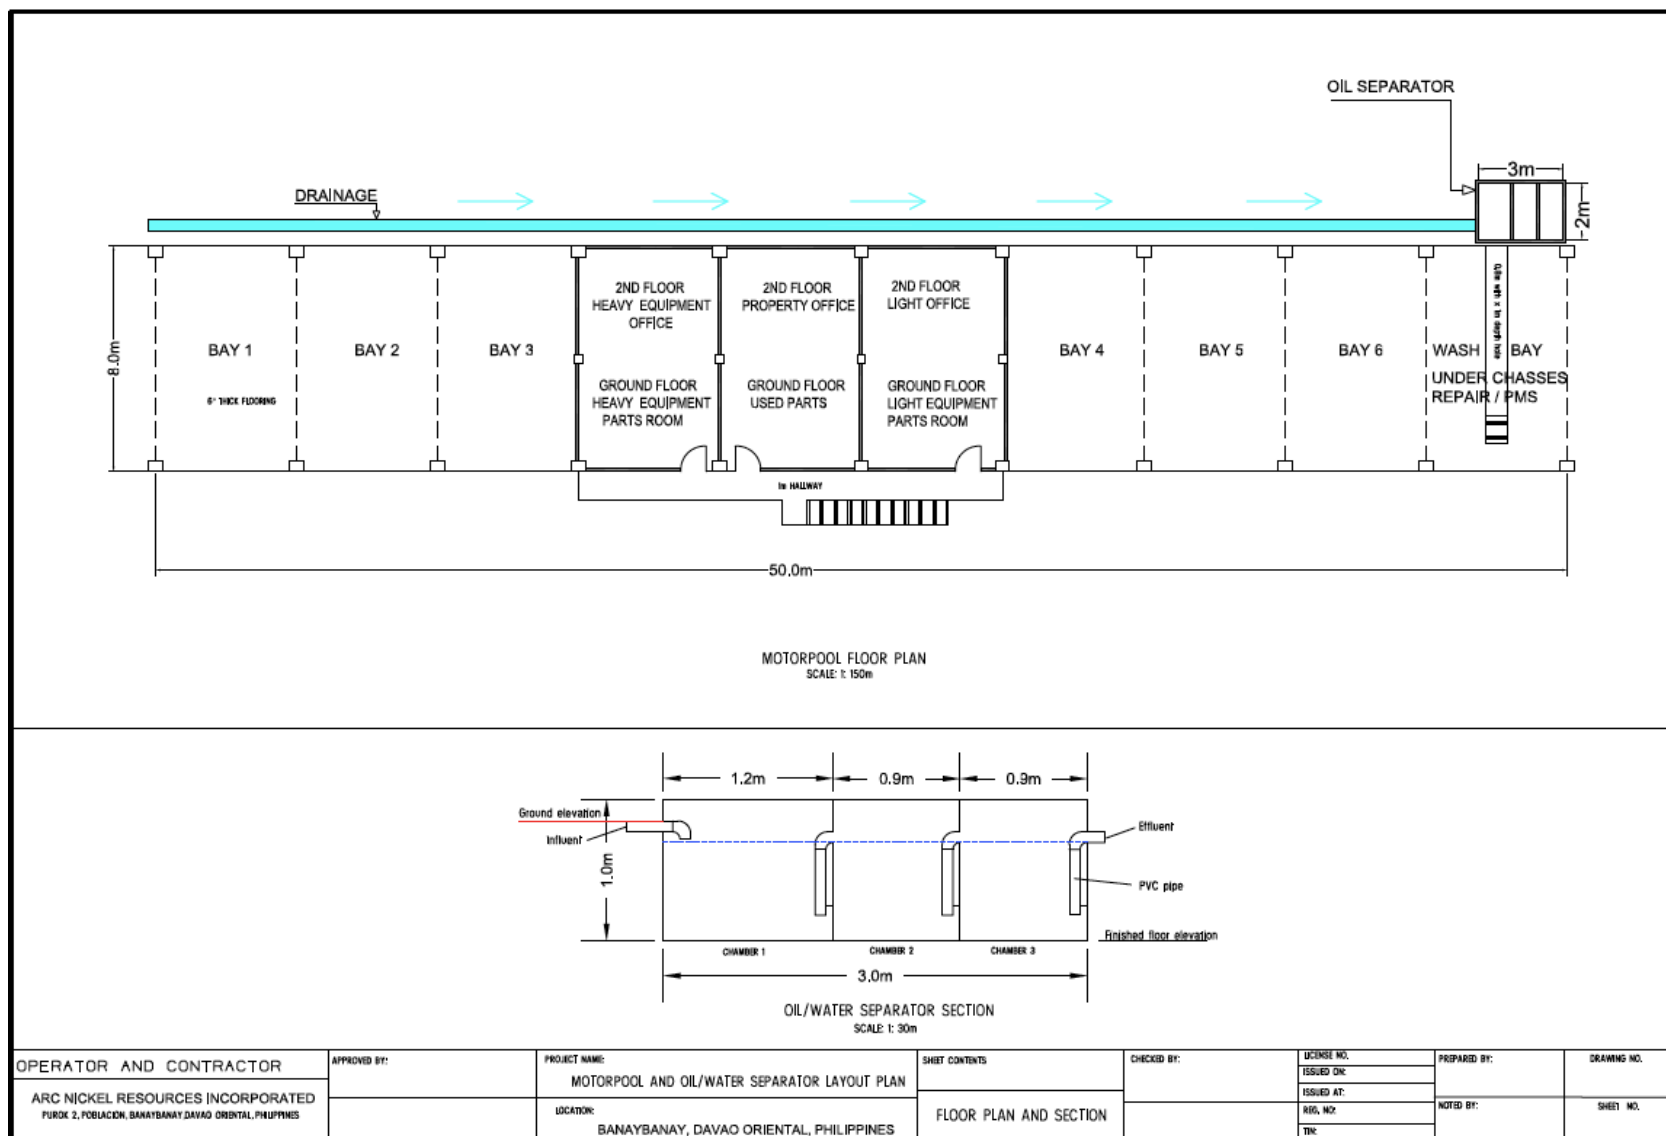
Motorpool and Oil & Water Separator Layout Plan (Source: RCMC)
